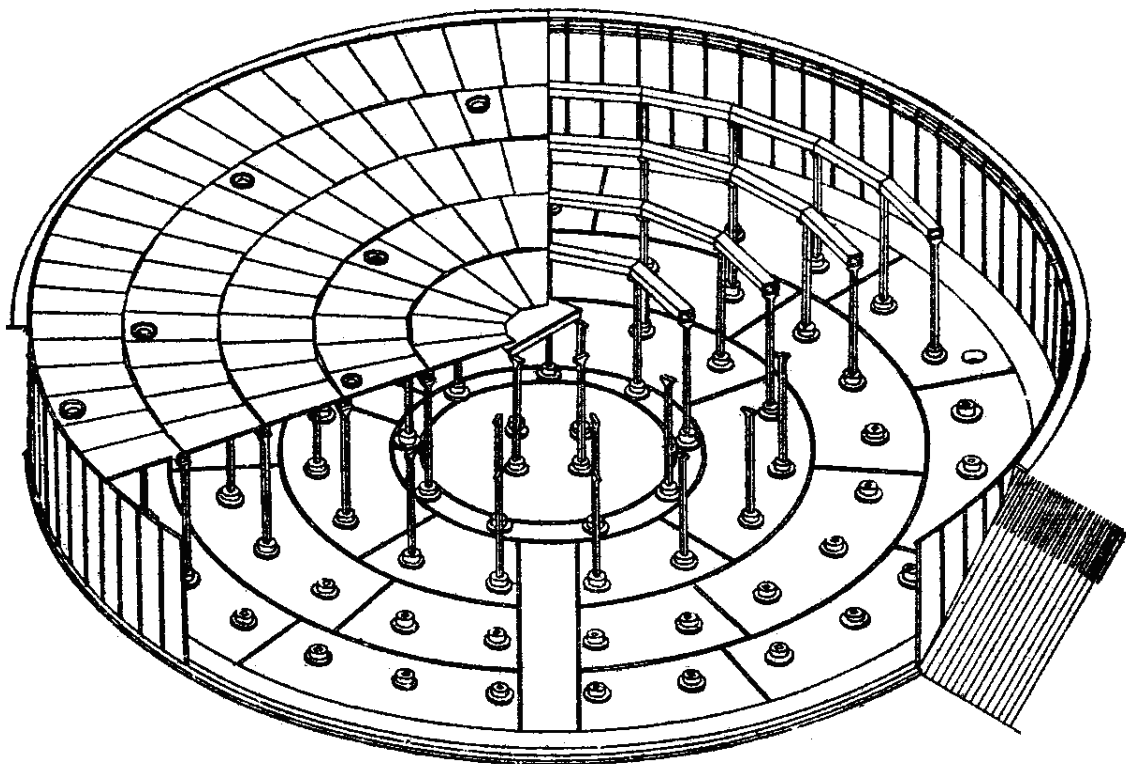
Recessed reinforced concrete tank for petroleum products with a capacity of 30,000 m<sup>3</sup>
